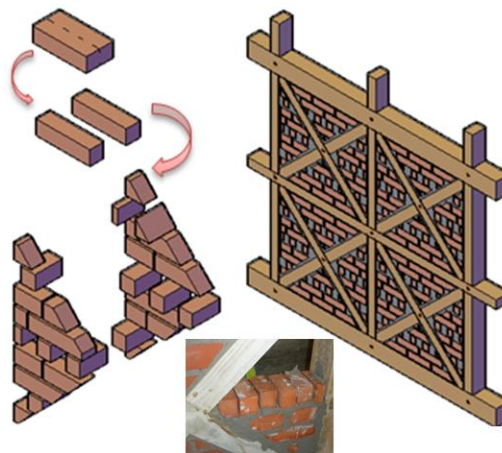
Timber frame walls: masonry pattern adopted for infill walls
